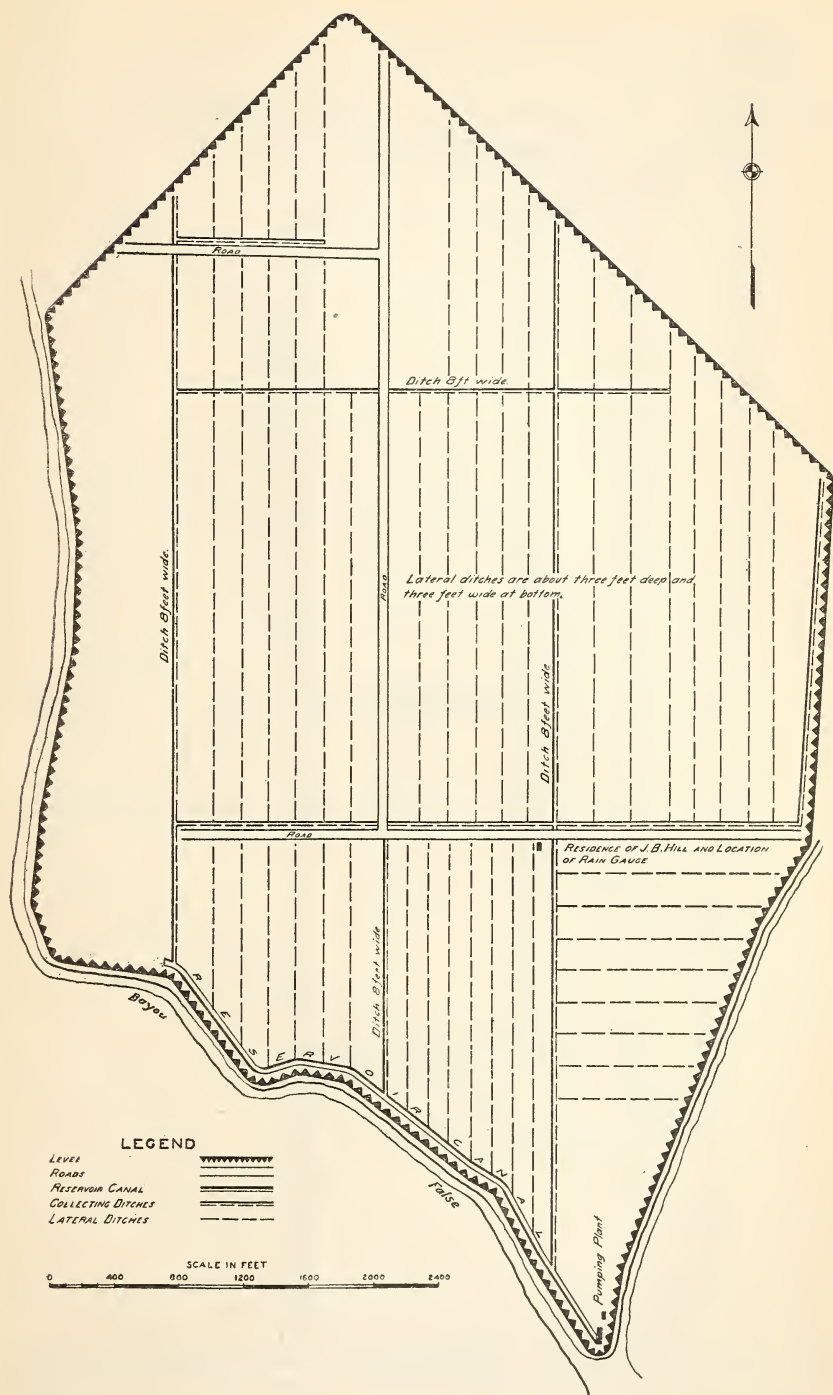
Map of Drainage District No. 2, near Raceland, La Fourche Parish, La., showing ditch and levee system.
